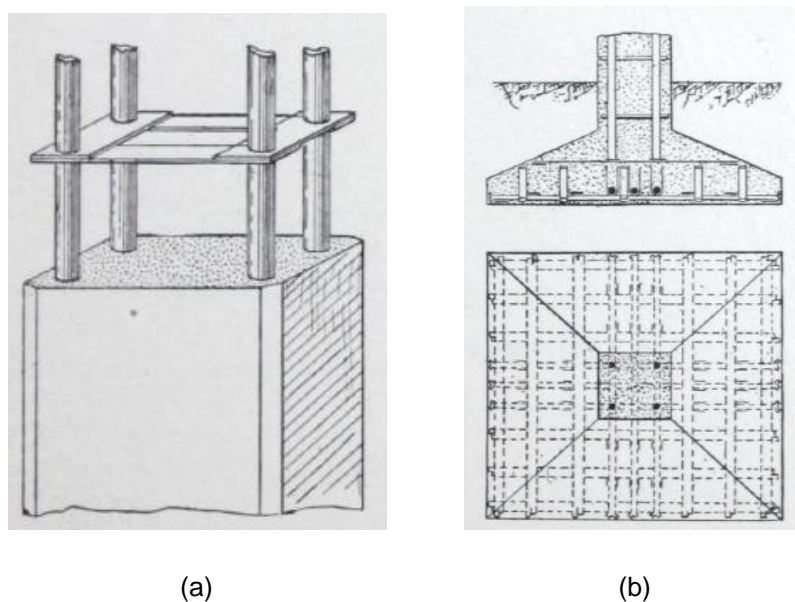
Hennebique elements (a) Column (b) Column footing [32]
